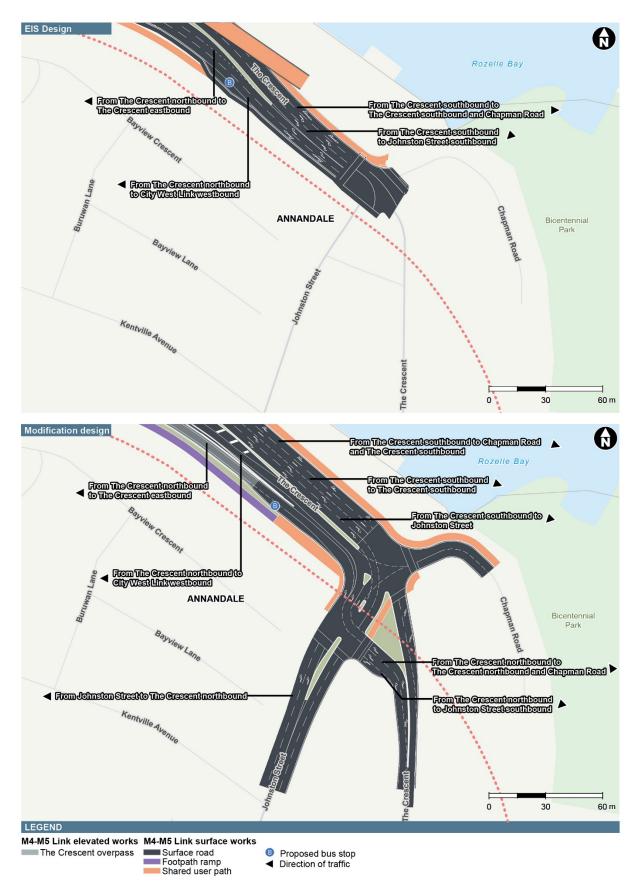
The Crescent/Johnston Street/Chapman Road layout in EIS and proposed modification model
